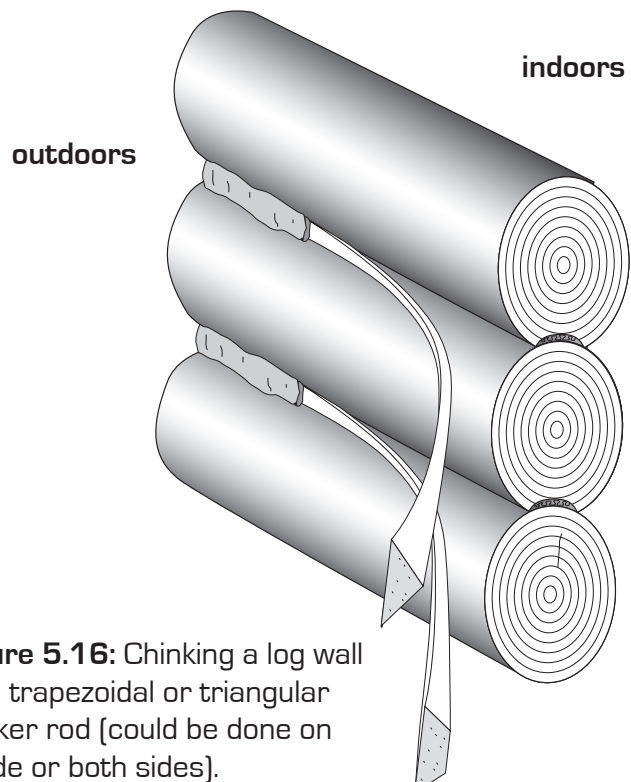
Chinking a log wall with trapezoidal or triangular backer rod (could be done on inside or both sides).
